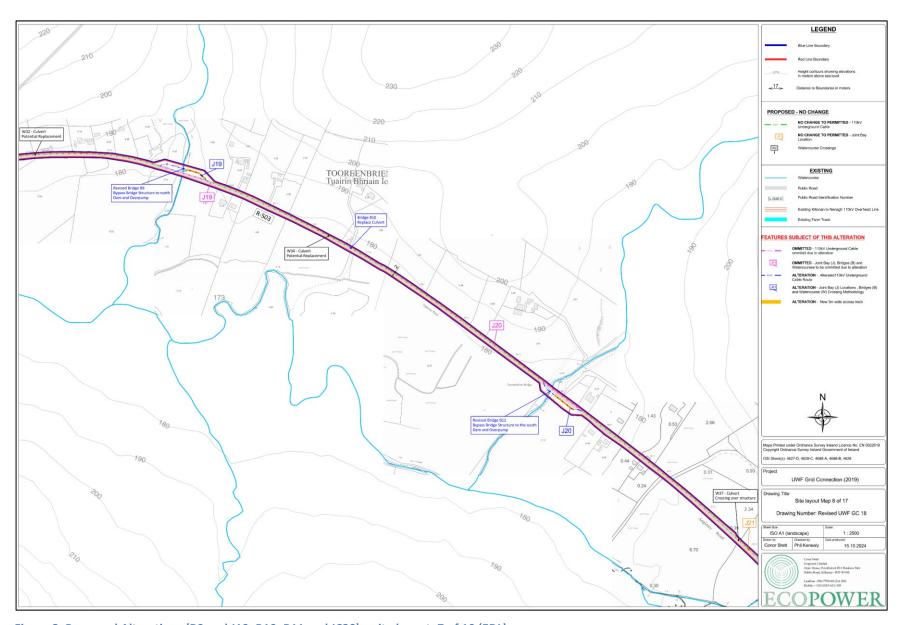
Proposed Alterations (B9 and J19; B10; B11 and JC20) – site layout, 7 of 10 (EDL).
